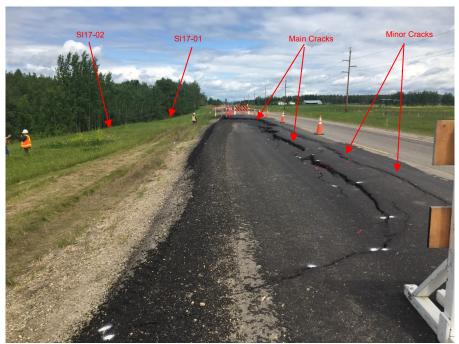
Pavement cracking from Call-Out Inspection. Looking north. Photo taken July 11, 2019.
